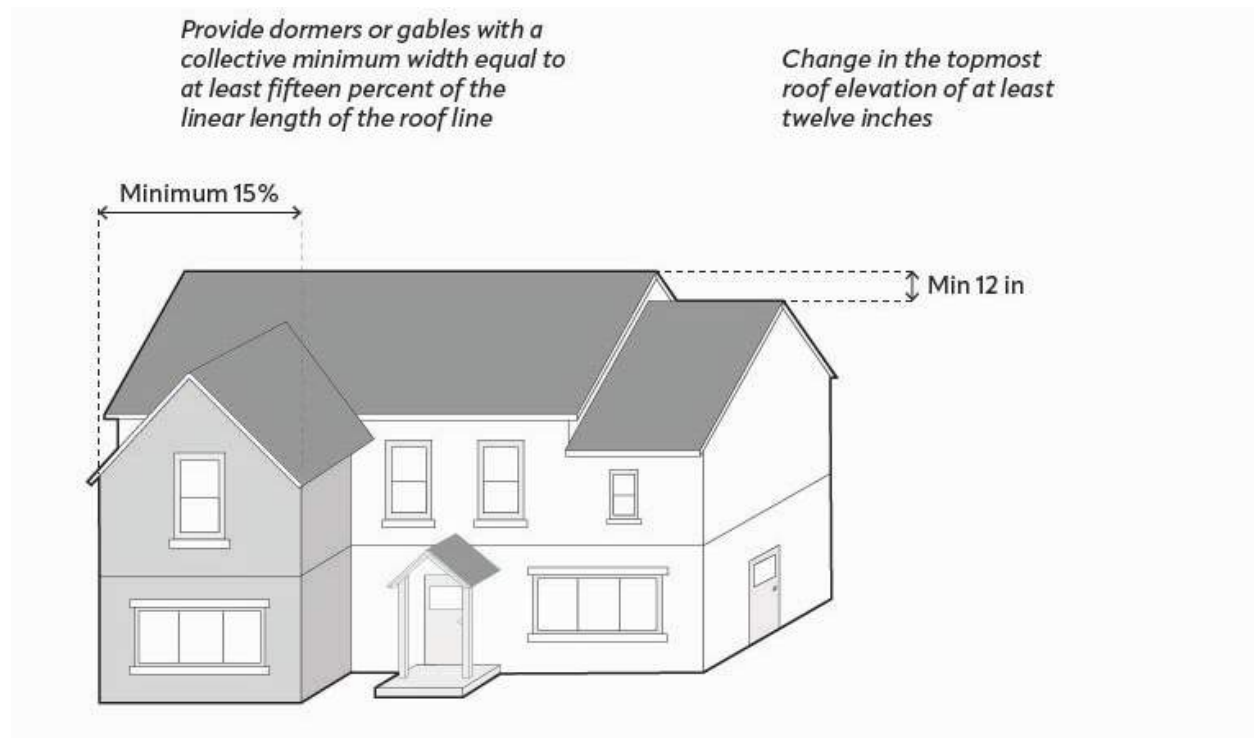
(A)(2)-A: ROOF DESIGN – SINGLE- TO FOUR-UNITS
